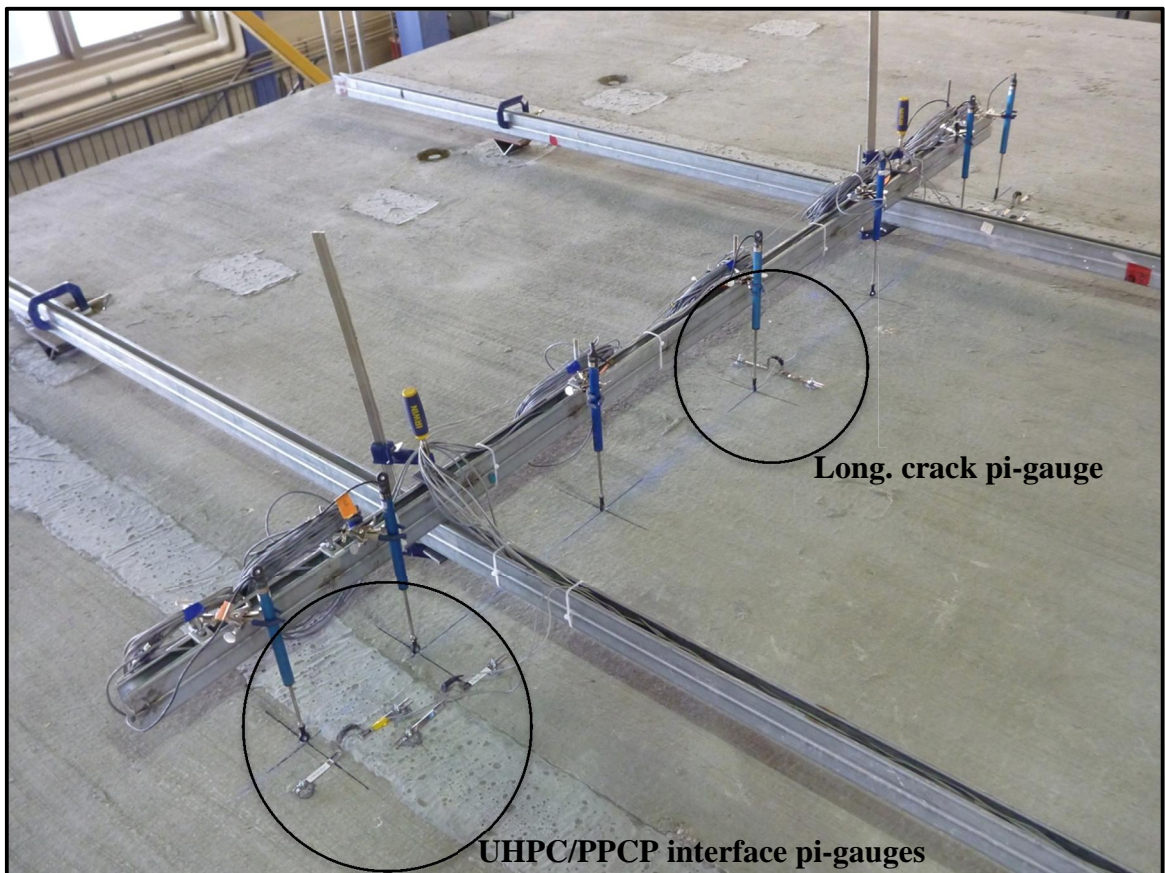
Typical Pi-Gauge Setup (Diagonal Crack Pi-Gauge Not Shown)
